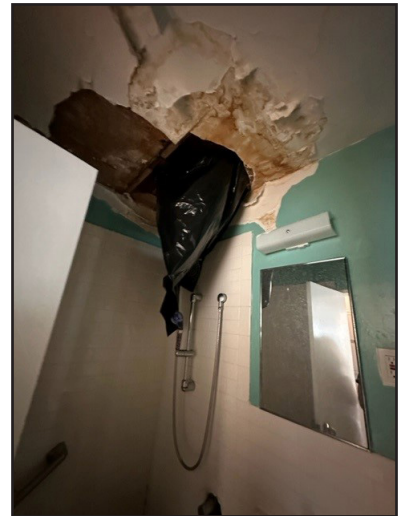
Collapsed ceiling in a bathroom of an Arverne unit.
